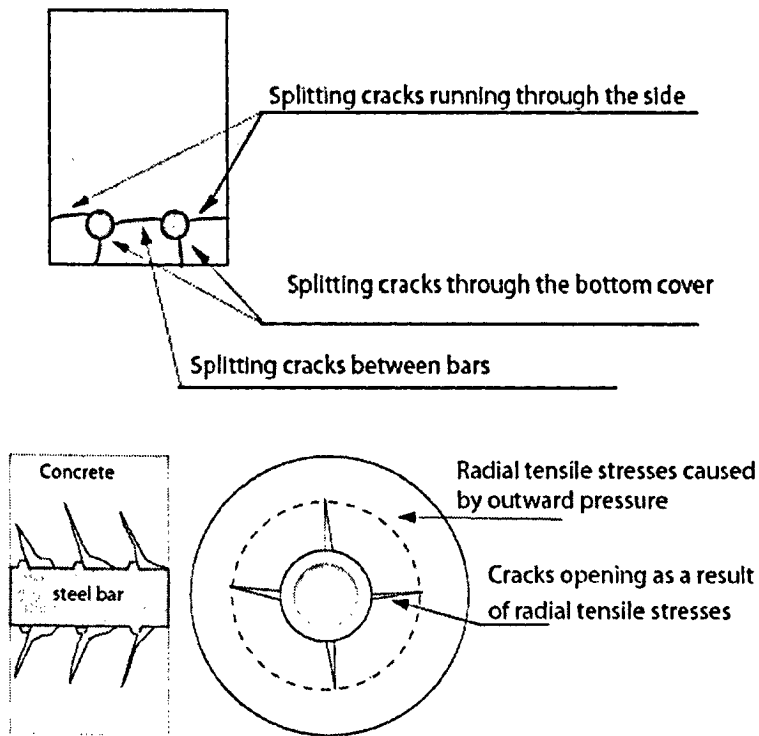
Splitting cracks running through concrete covers and between bars.
